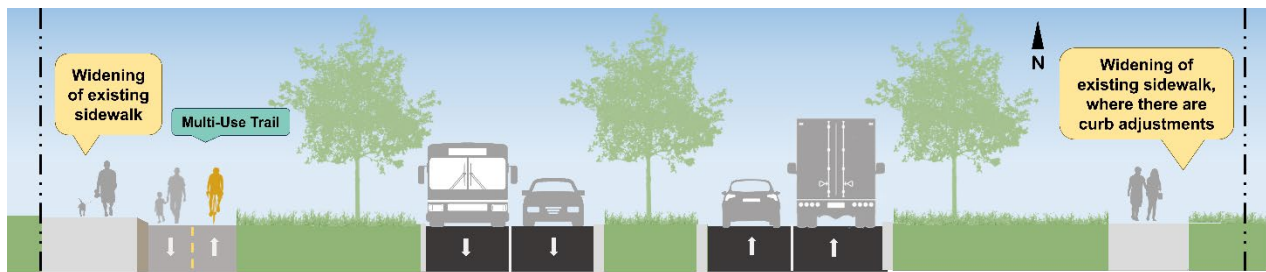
Kipling Avenue Proposed Cross-Section - Finch Avenue West to Albion Road
